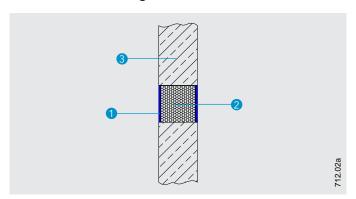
Detail E - Joint filling coated on the unexposed side with combustible backfilling in wall
